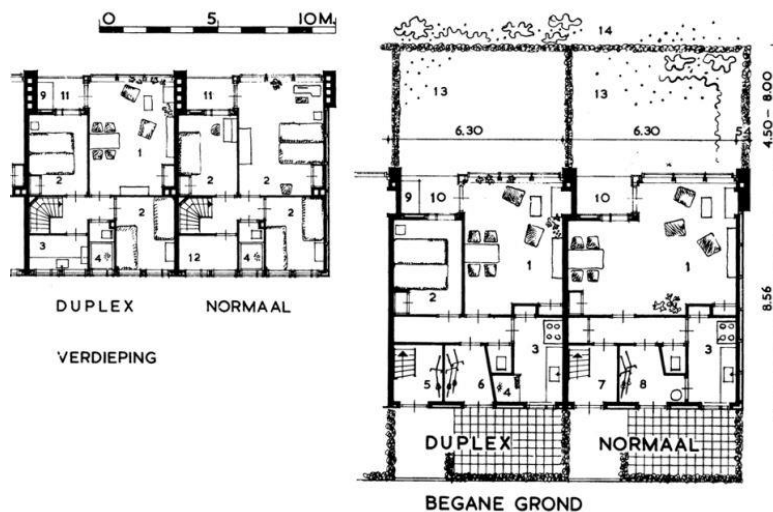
Floor Plans of the Houses in The Siedlung Frankendaal (Zijlstra, 2007)
